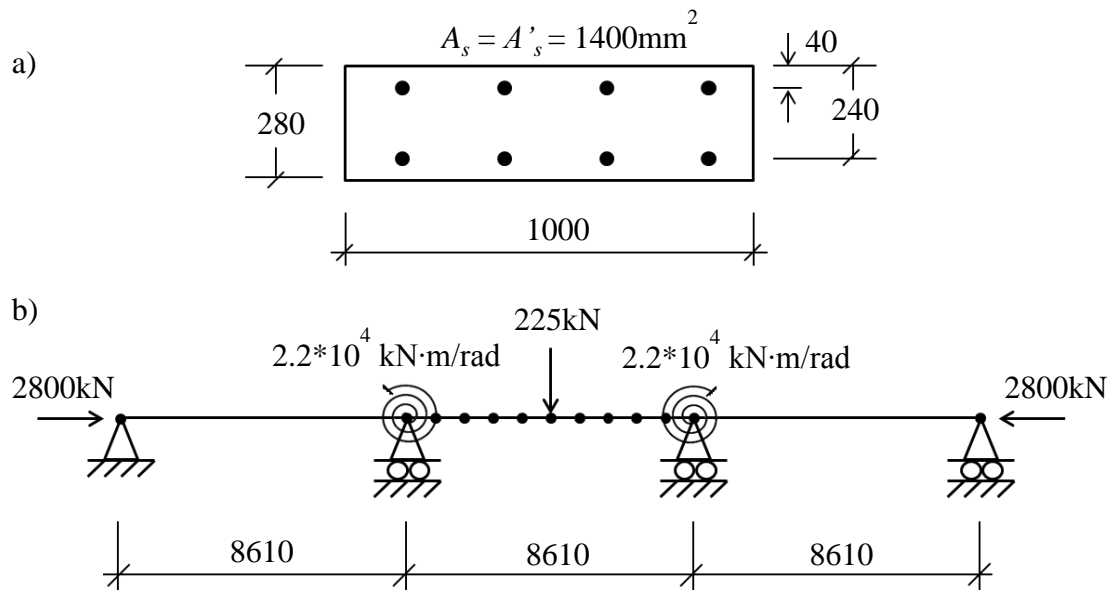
Cable-stayed bridge deck; a) cross section; b) idealized structural system (dimensions in mm).
